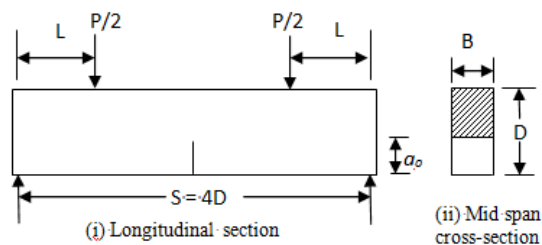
Dimensions and loading schemes of four-point bending test specimen
